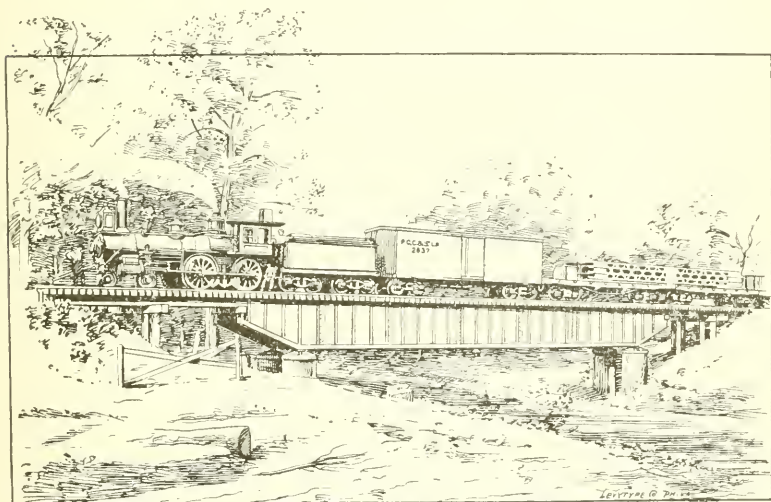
CANTILEVER PLATE-GIRDER BRIDGE OVER PERUQUE CREEK.
